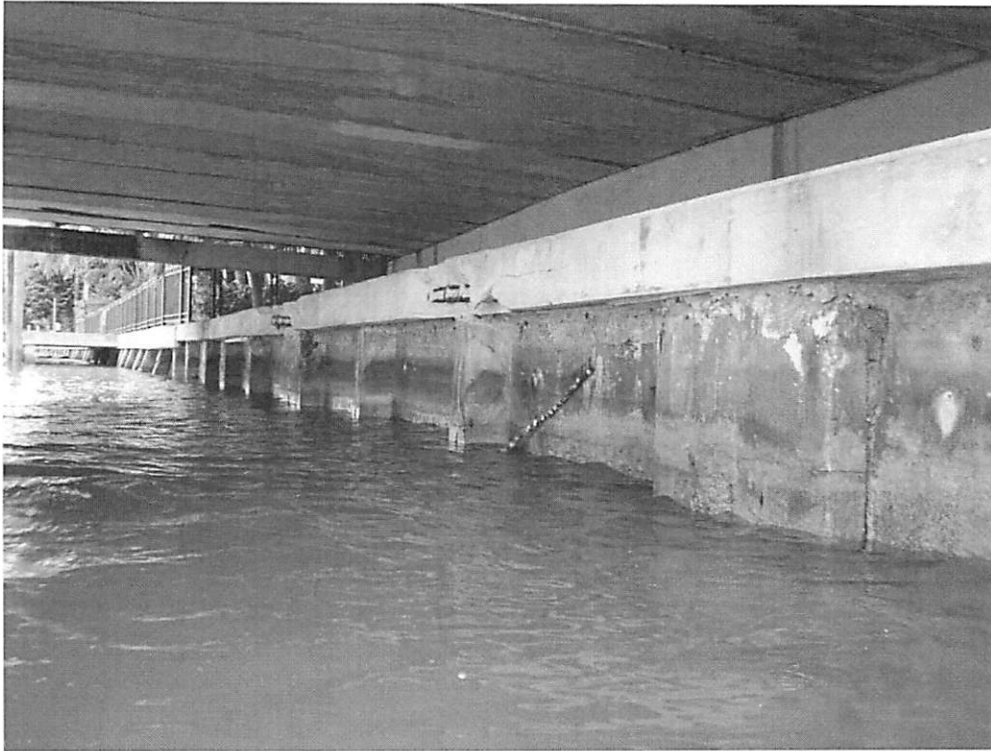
Longitudinal Spall Cracking in Cap, Rusted Reinforcement
